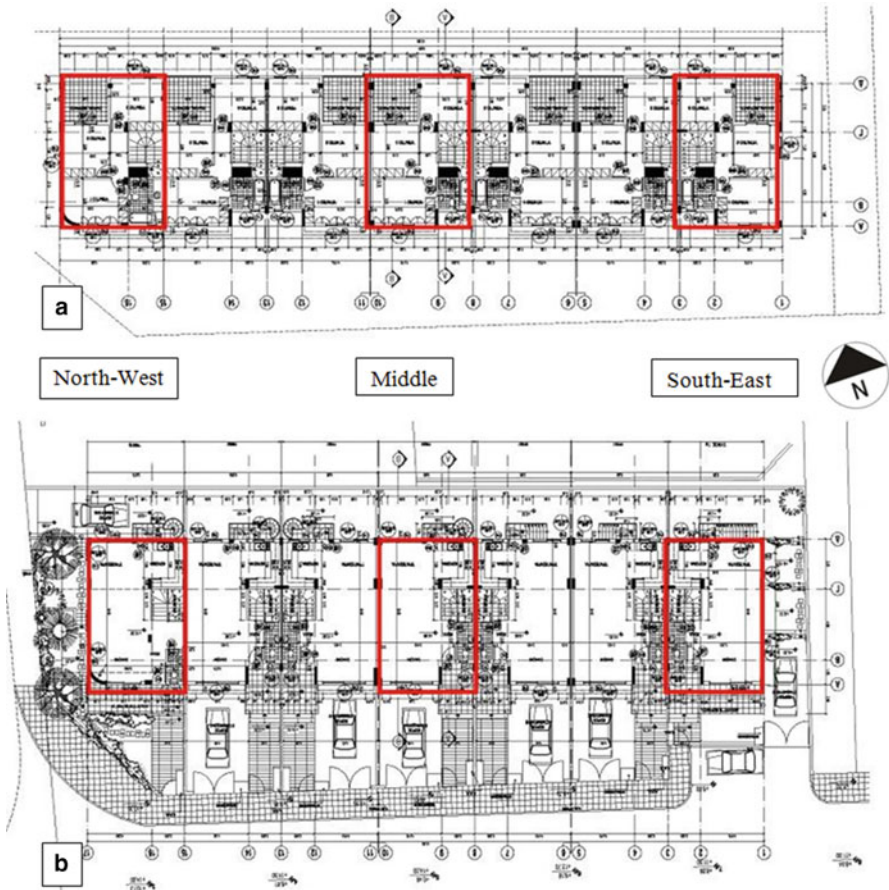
Layout of dwellings under study. (a) First floor. (b) Ground floor
